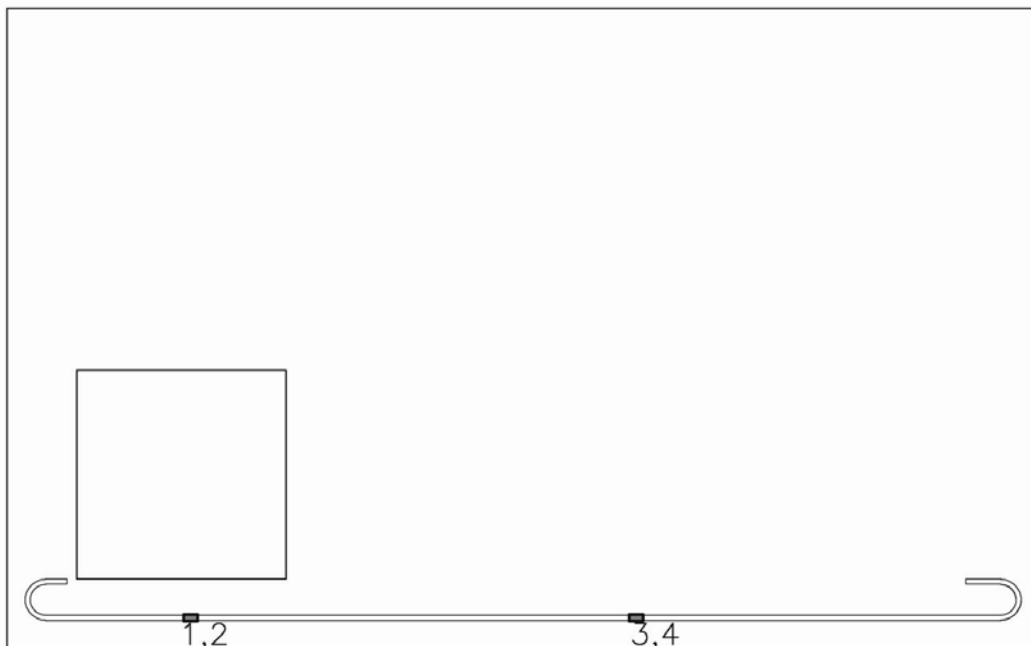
Steel reinforcing bar layout of SFRC specimen – Front face.
